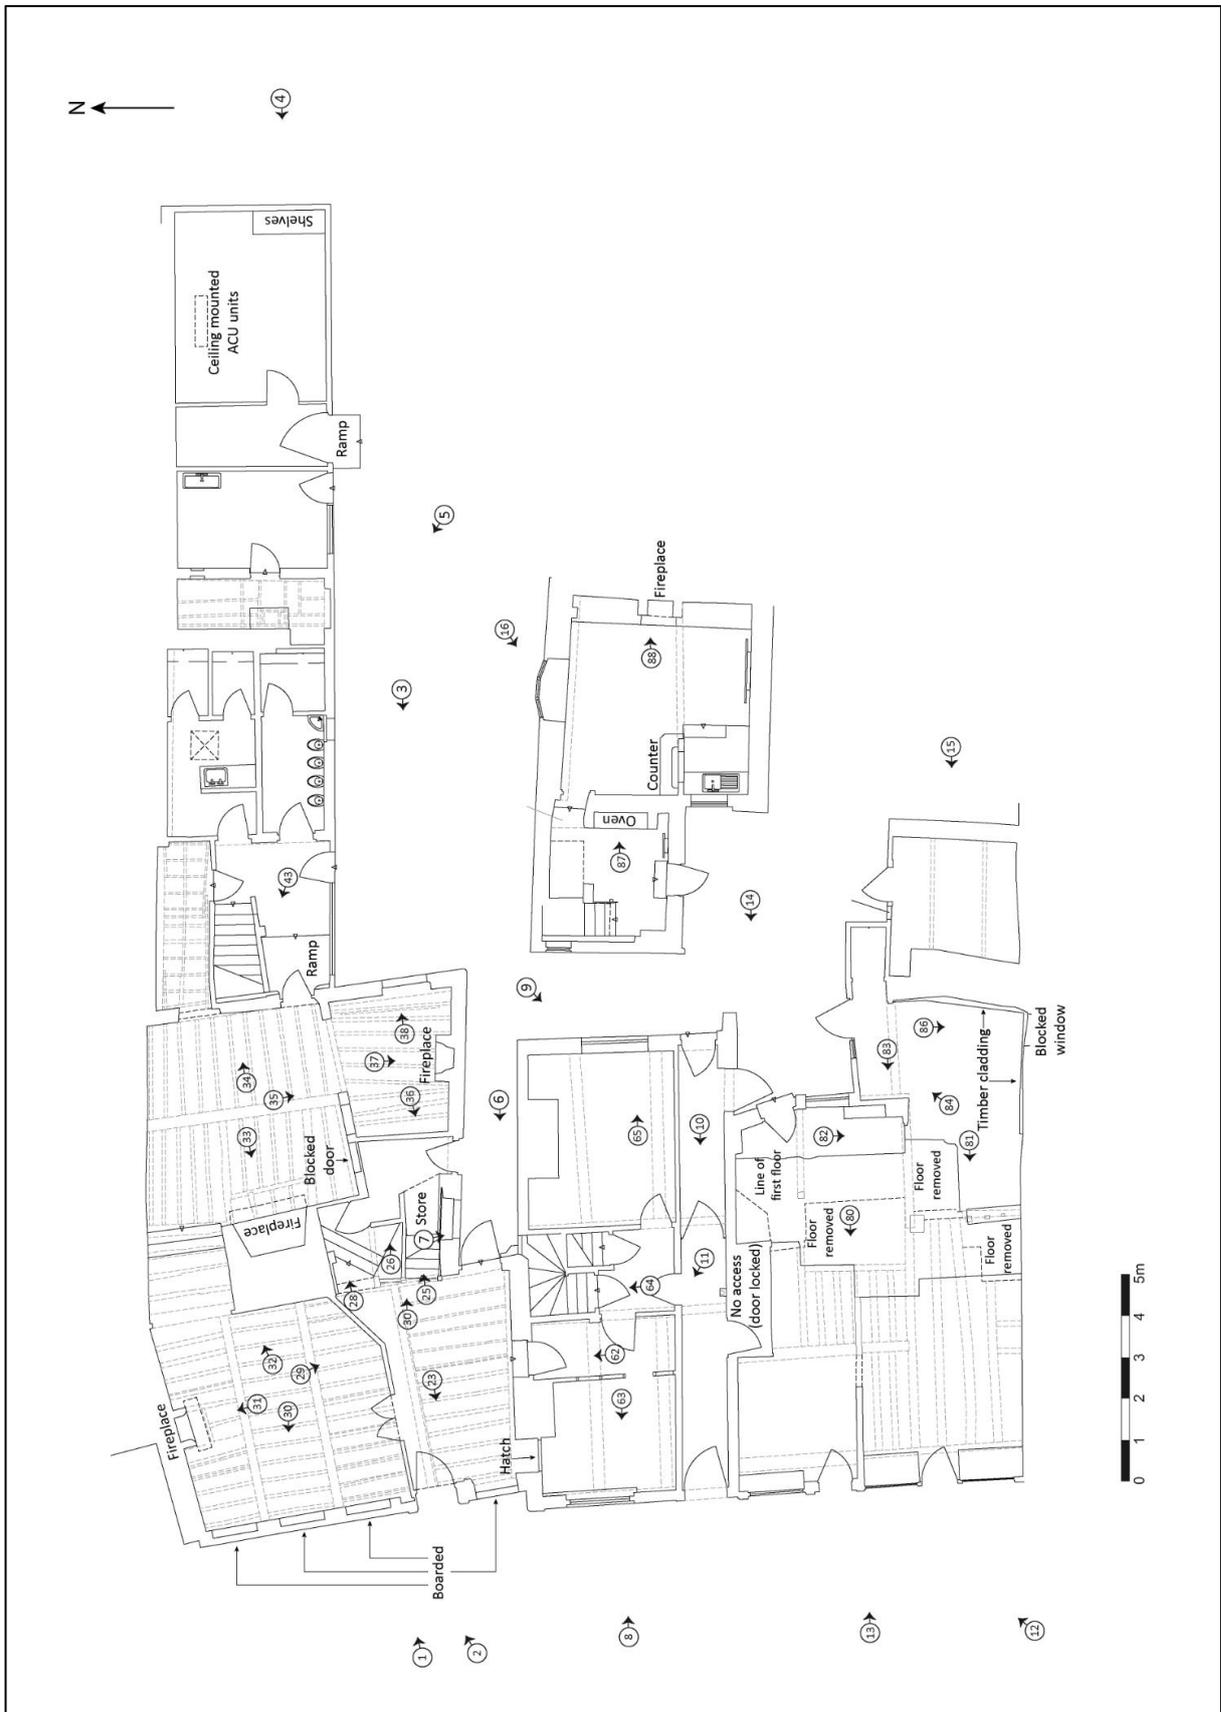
Annotated plan of ground floor of Nos 17-19 High Street showing location of photos taken
